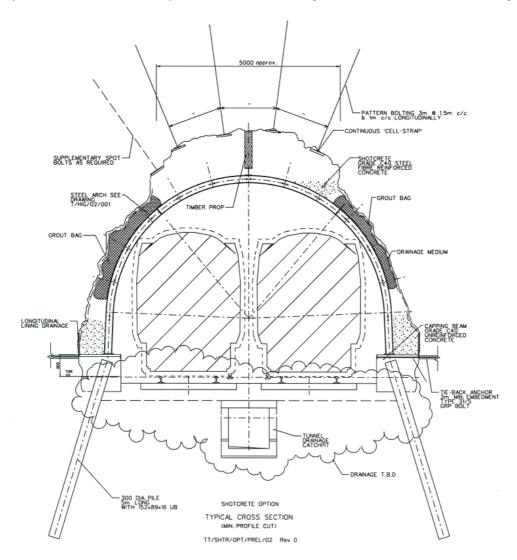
Typical cross section showing various aspects of the tunnel refurbishment works
